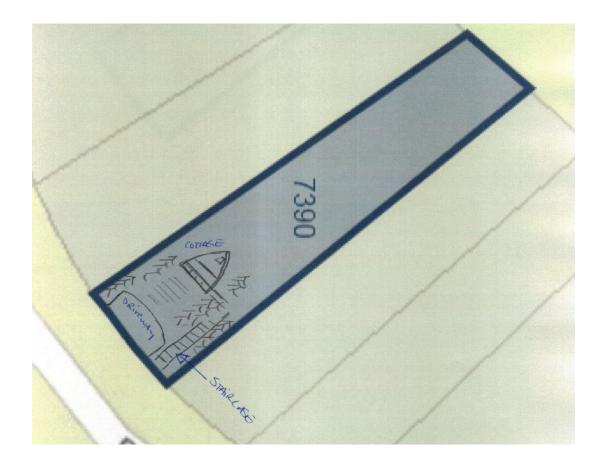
Image showing staircase placement on property (refer also to Image #1 for stair placement as new stairs will replace old)
